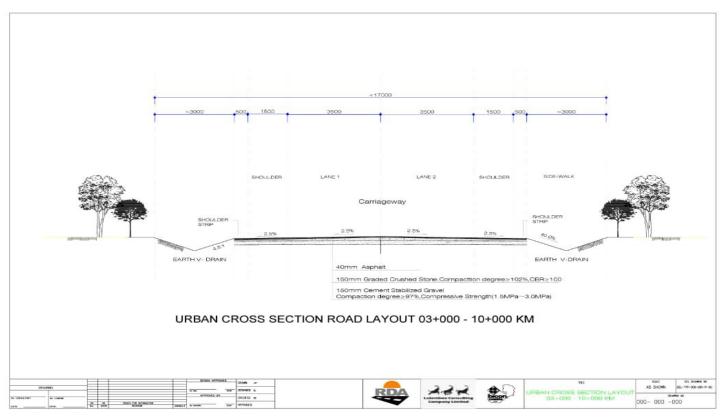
Urban cross section road layout 03+000 - 10 + 0000 KM
